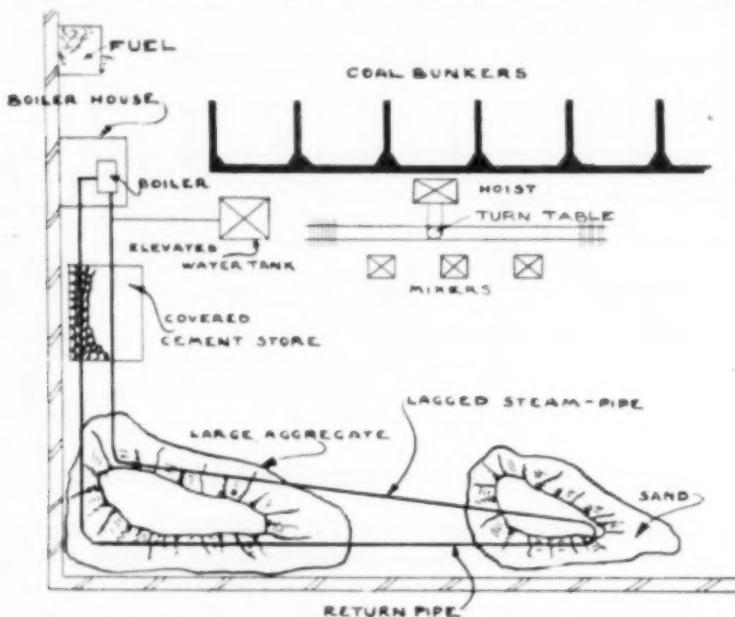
Arrangement for Heating Concrete Materials and Mixing Water.
